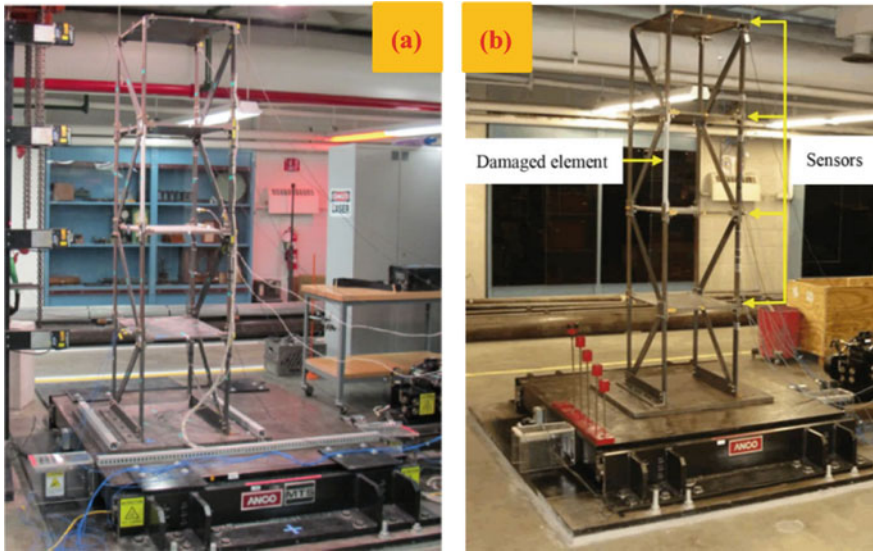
Four-story shear-type steel frame [11]; a healthy and b damaged
